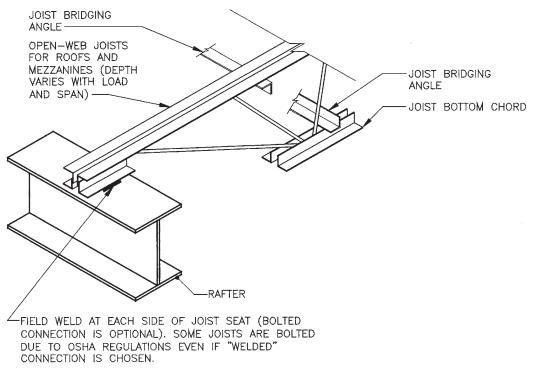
Open-web joist attached to frame rafter. (Nucor Building System.)
